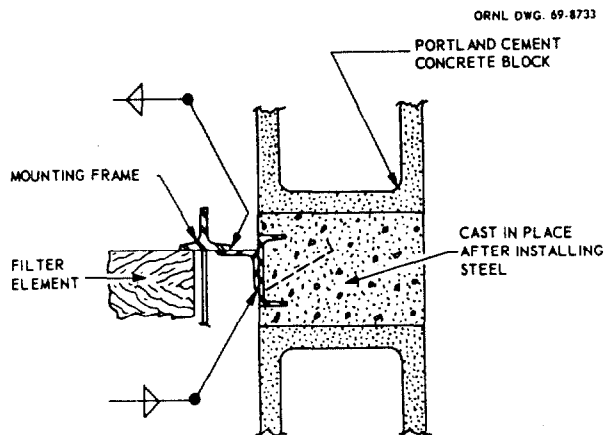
Embedded structural member for walls and ceilings of masonry (shown) or concrete housing. Channel with flanges down is not suitable for floors, because trapped air would cause voids.
